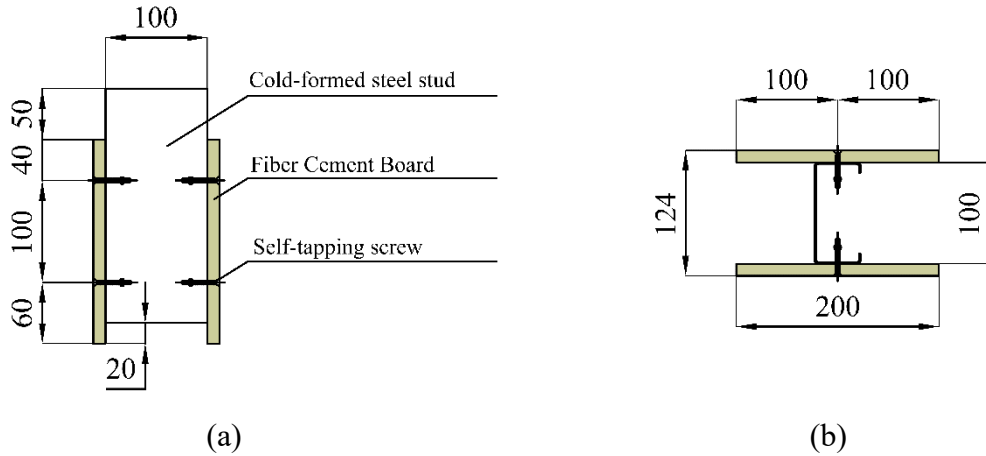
Push-out test specimen dimensions - (a) side view, (b) top view
